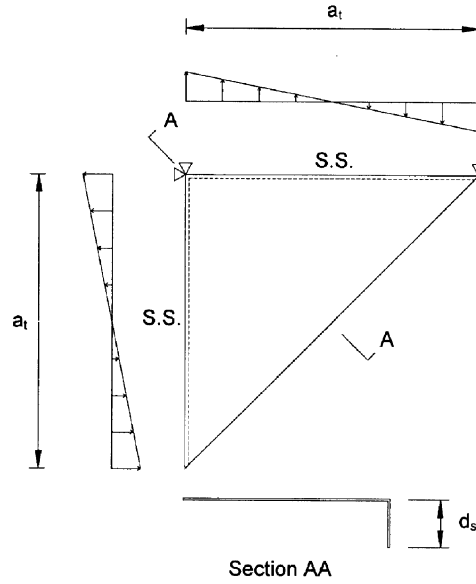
Details of edge-stiffened triangular plate used in parametric study to determine stiffener depth
